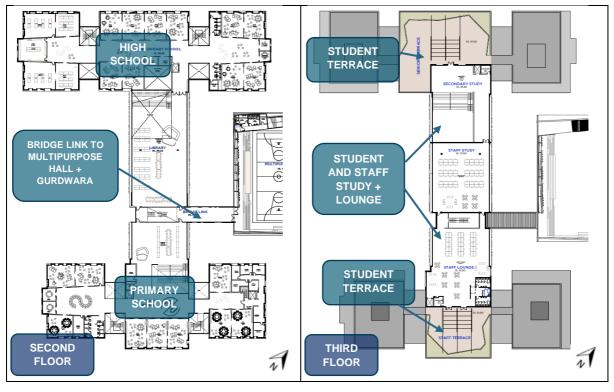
| Second and third floor plan (Source: Applicant's RtS 2020)
